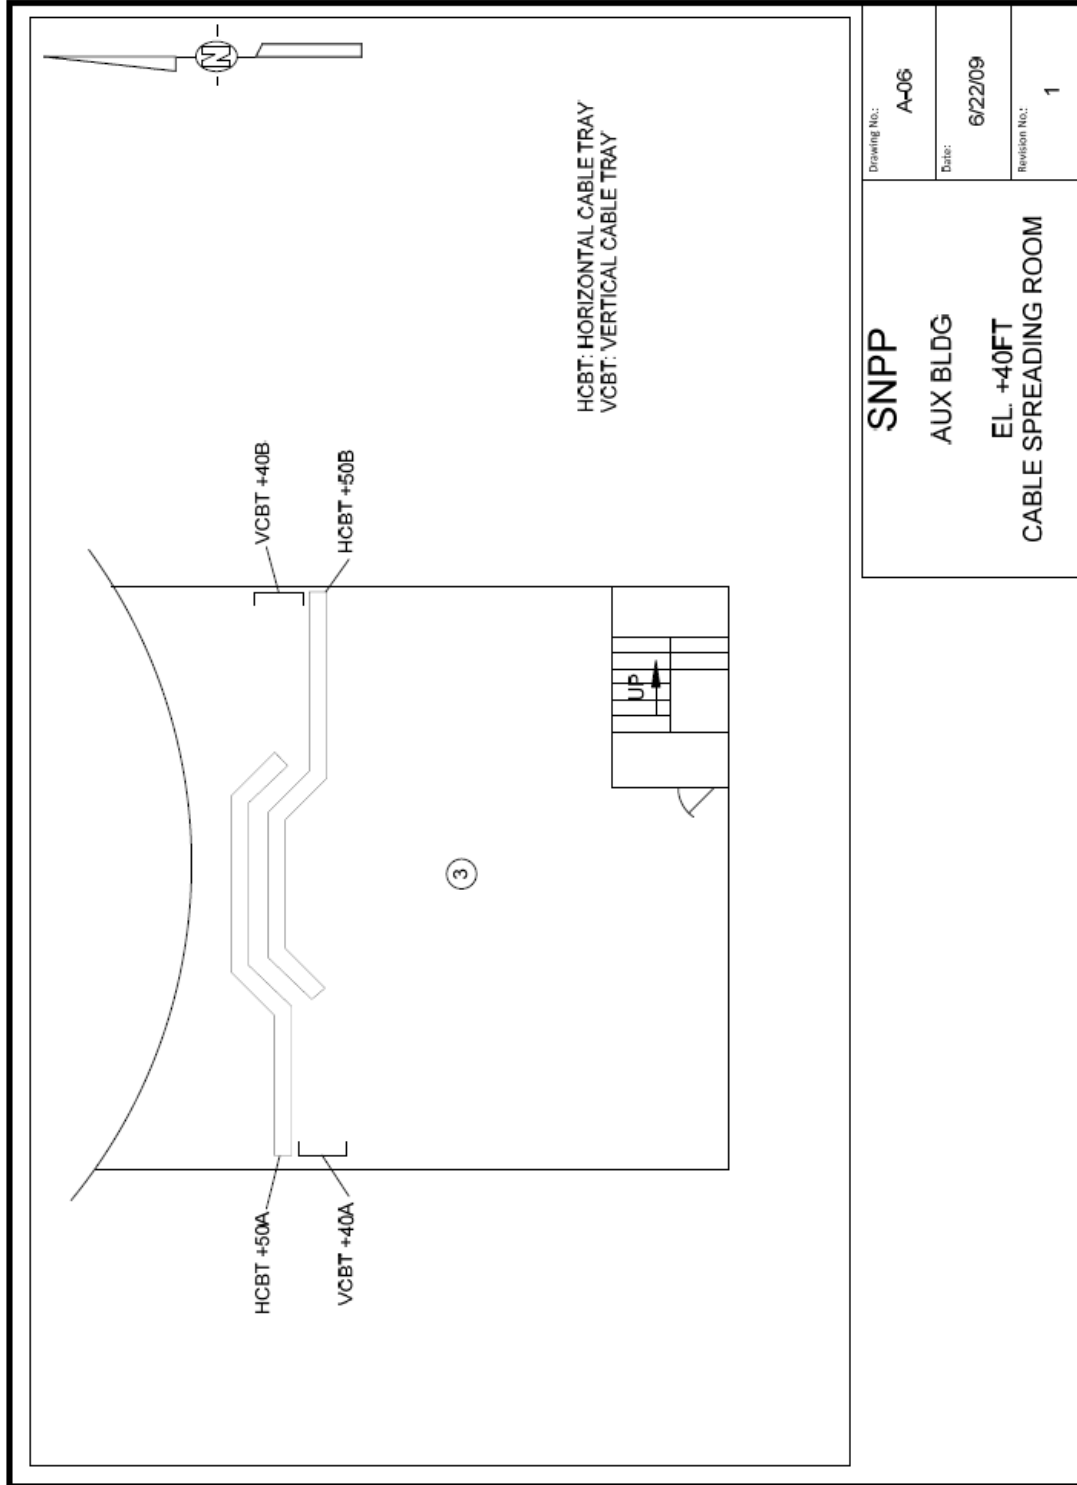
Auxiliary Building – Elevation +40 Ft.
